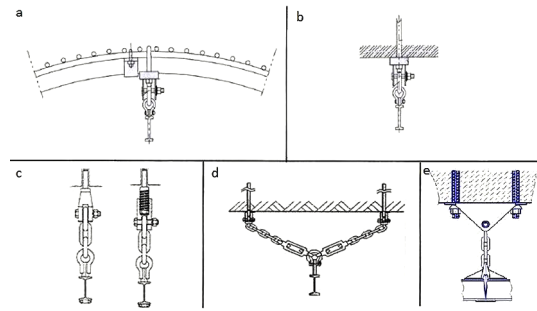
Alternatives of the suspended monorail road fastening to a mine working roof:
